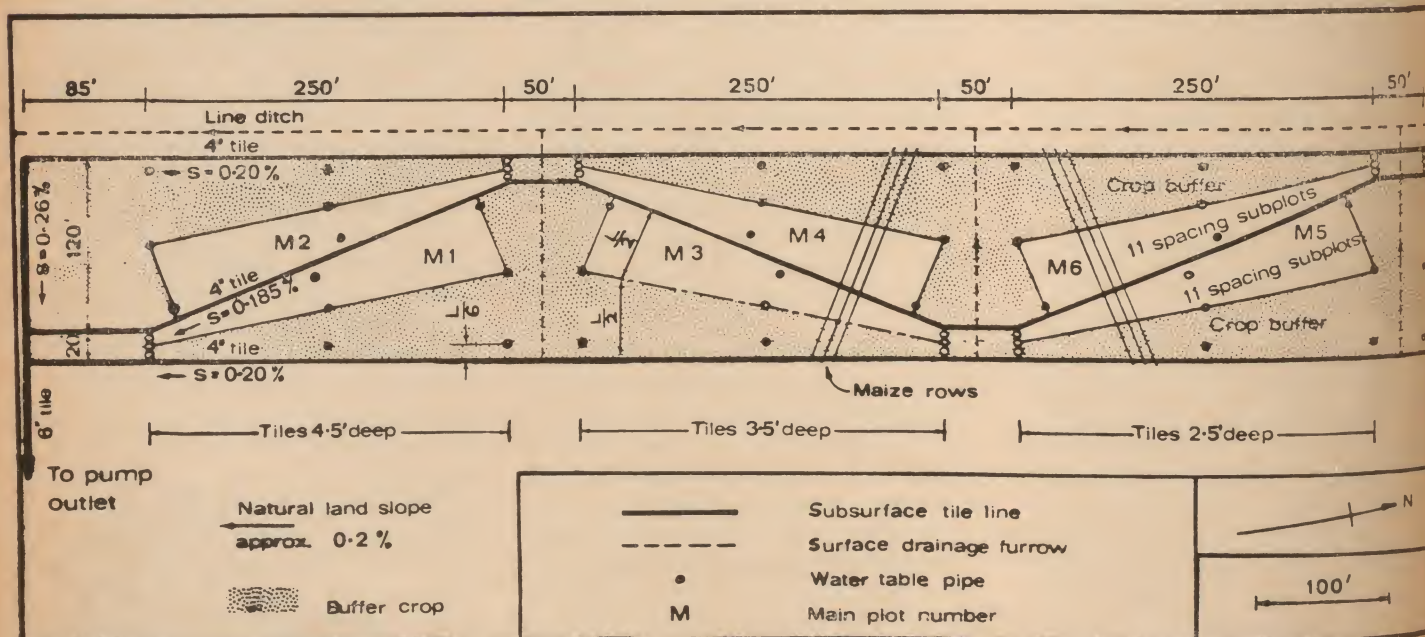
LAYOUT OF SUBSURFACE DRAIN DEPTH AND SPACING EXPERIMENT
